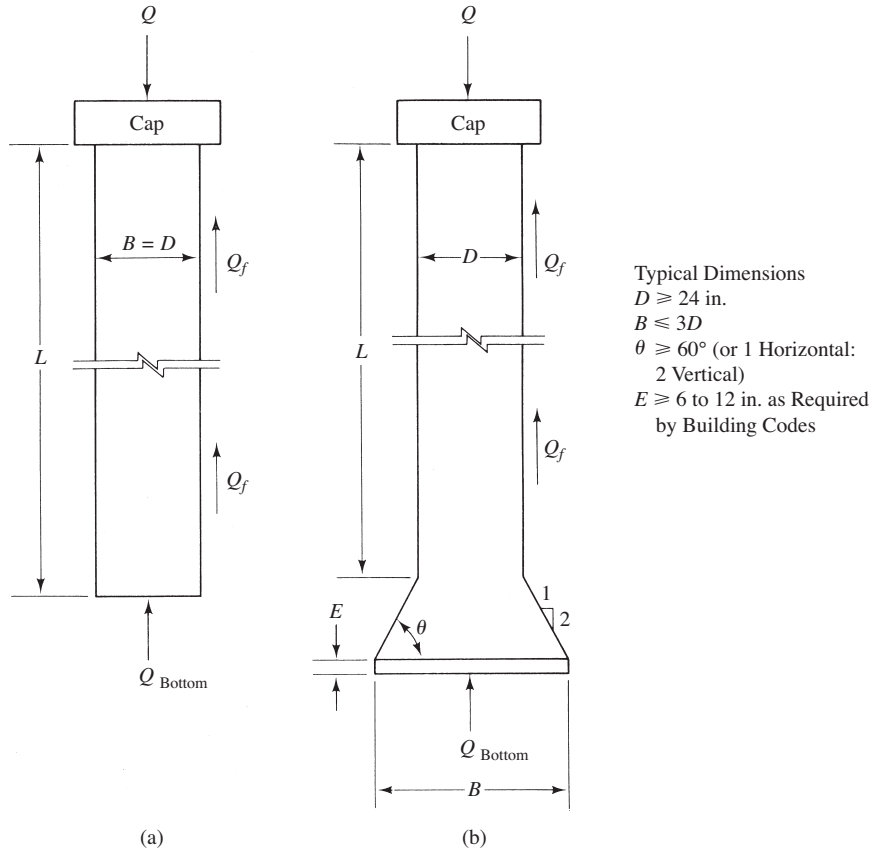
Drilled shafts: (a) straight-shaft; (b) belled.
